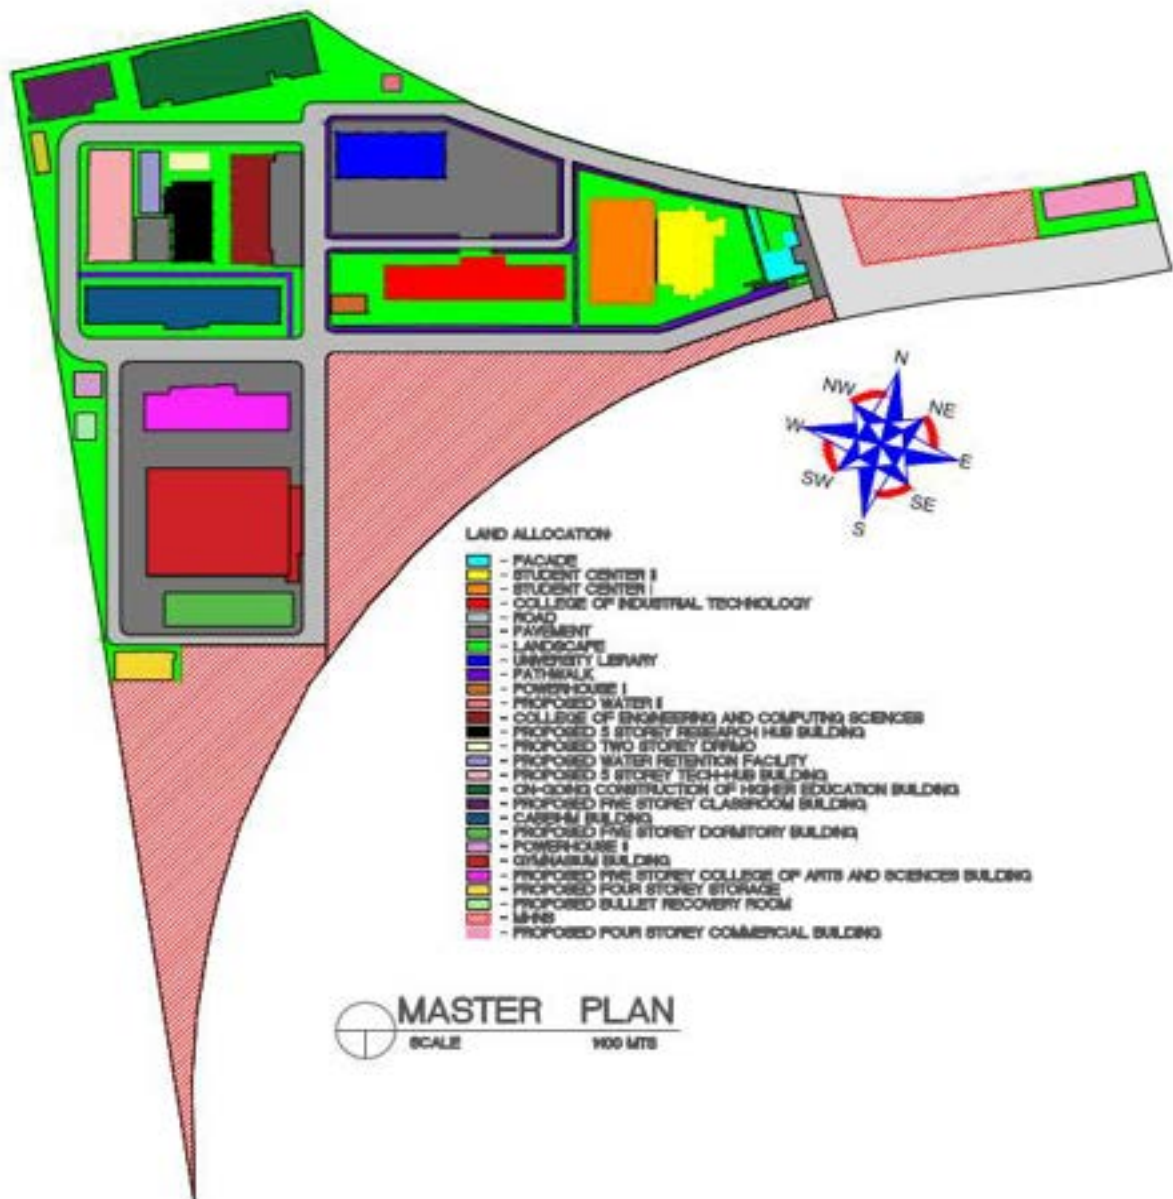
Master Plan of BatStateU JPLPC - Malvar
